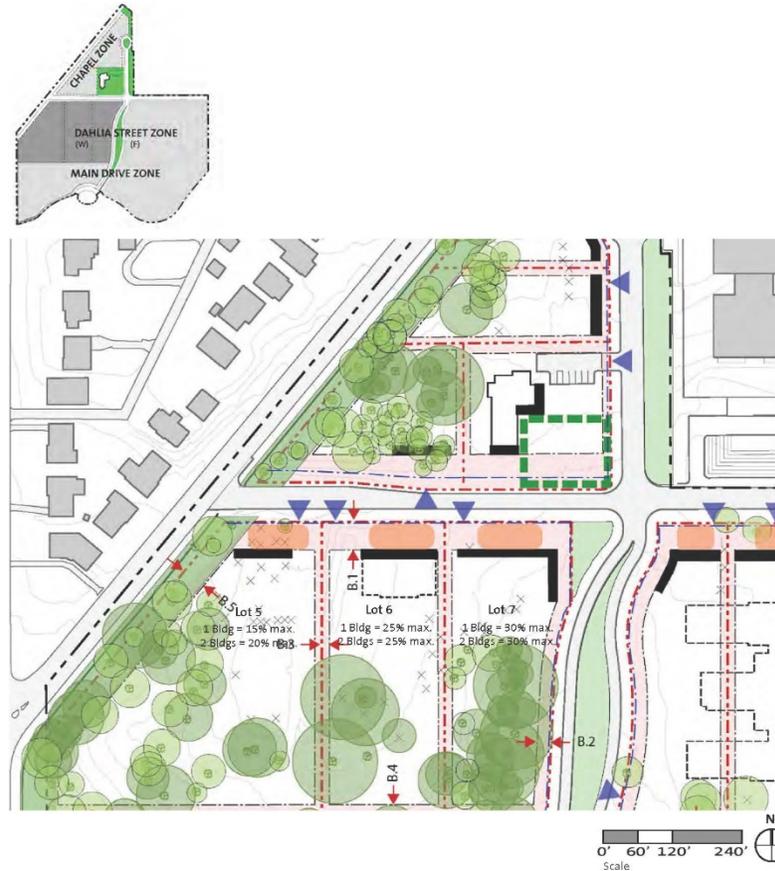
Foreign Missions Center - Dahlia Street (west) Zone Setbacks Diagram
